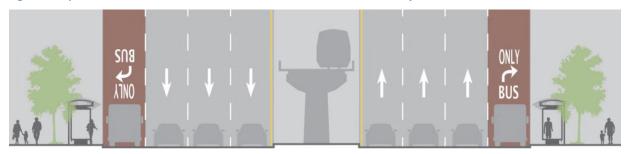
| Alternative 3 cross-section of Tyco Road from Route 7 to Spring Hill Road
